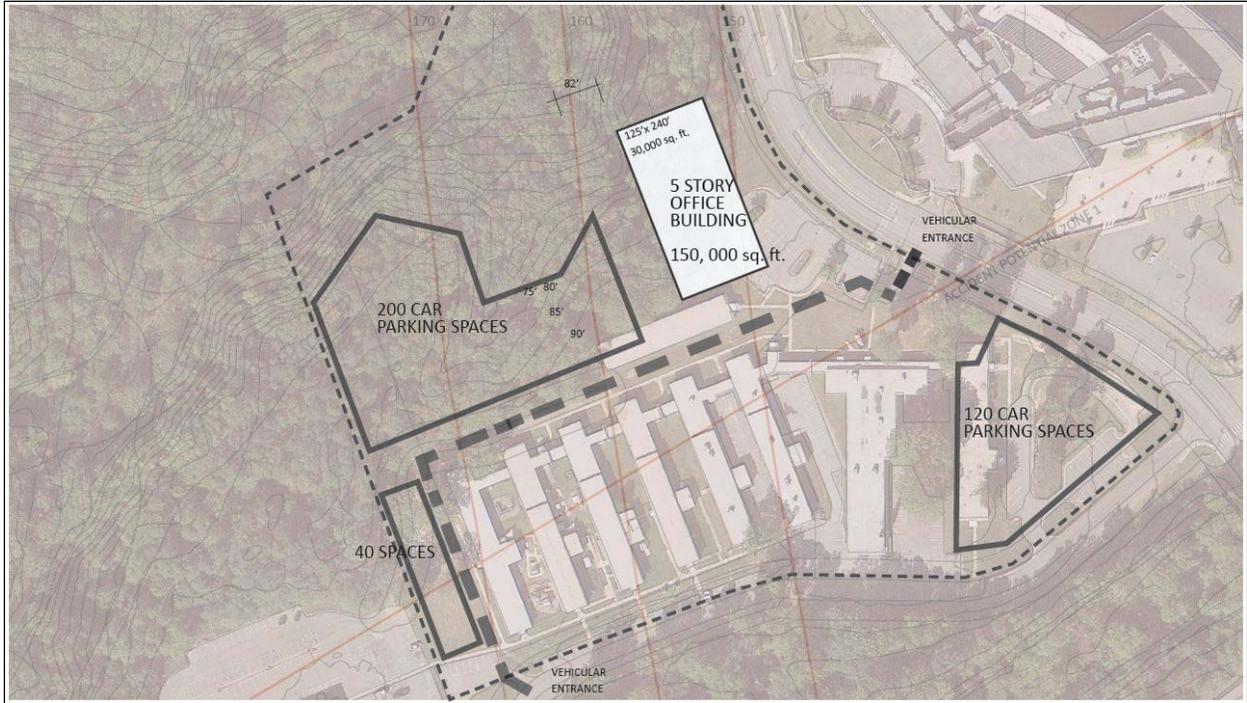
EUL Site 5 Conceptual Site Schematic Layout
